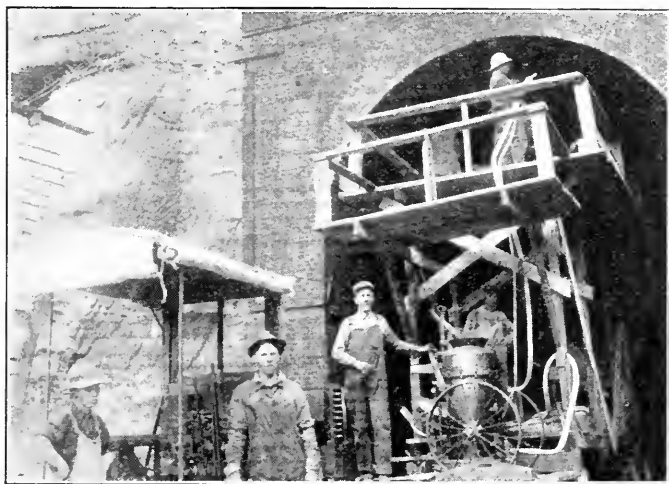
Use of Cement Gun on Tunnel Repair Work.
